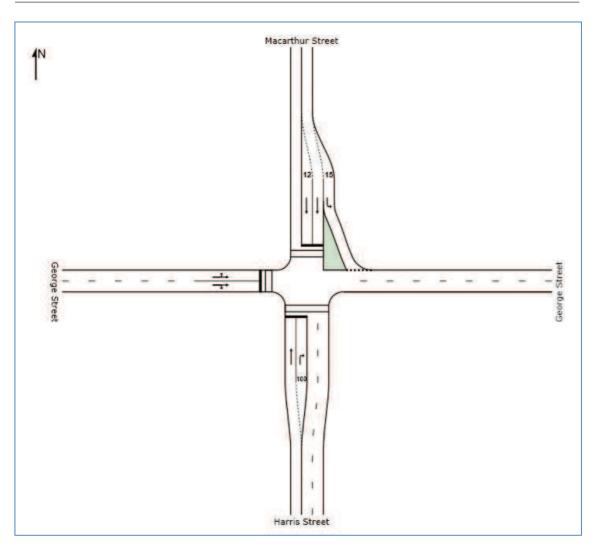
Modified George Street/Harris Street Intersection Layout
